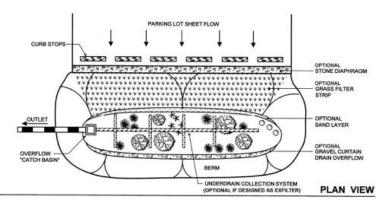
Typical plan view of a bioretention area. (Image source: Rhode Island Stormwater manual, 2010)
